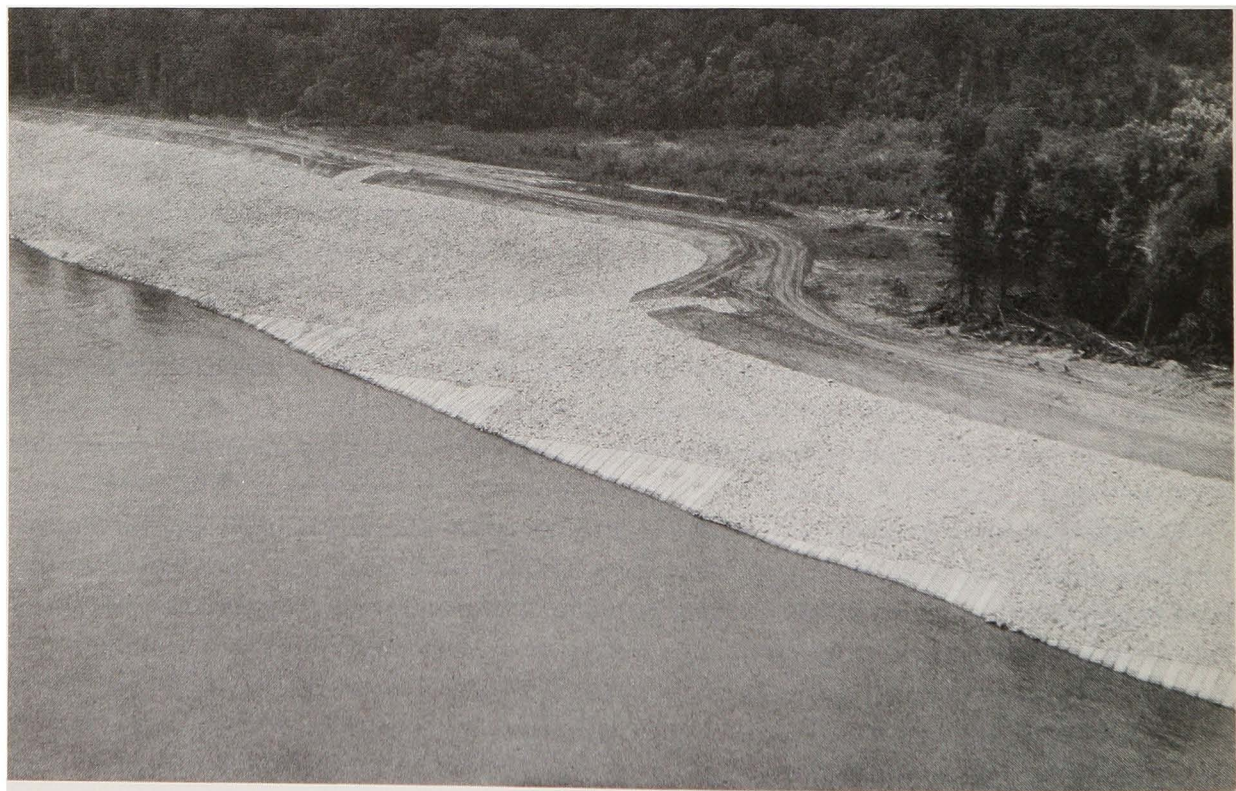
Completed revetment showing upper portion of articulated concrete mattress and riprapped upper bank
